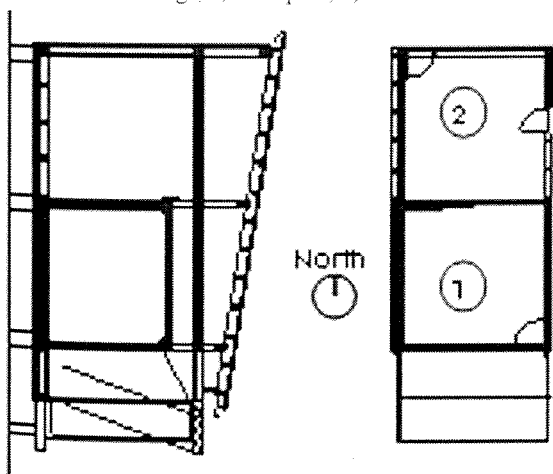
PTC drawings; a) floor plan; b) cross-section.
